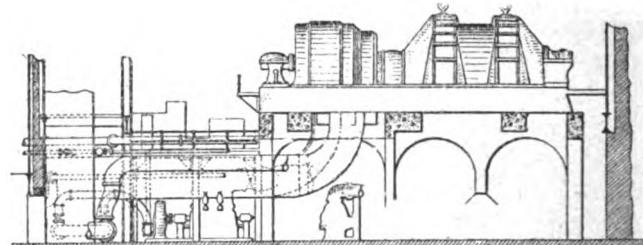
CROSS-SECTION OF ENGINE ROOM SHOWING NEW 30,000 K.W. TURBO-GENERATOR.
